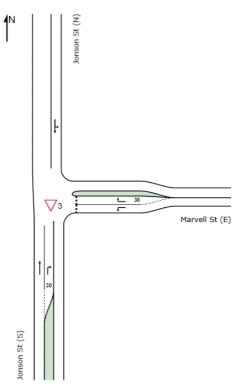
Jonson Street / Marvell Street SIDRA Intersection Layout
